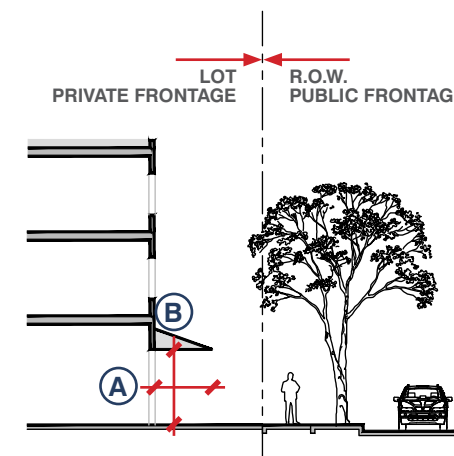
RESIDENTIAL GROUND FLOOR PATIO FRONTAGE SECTION
